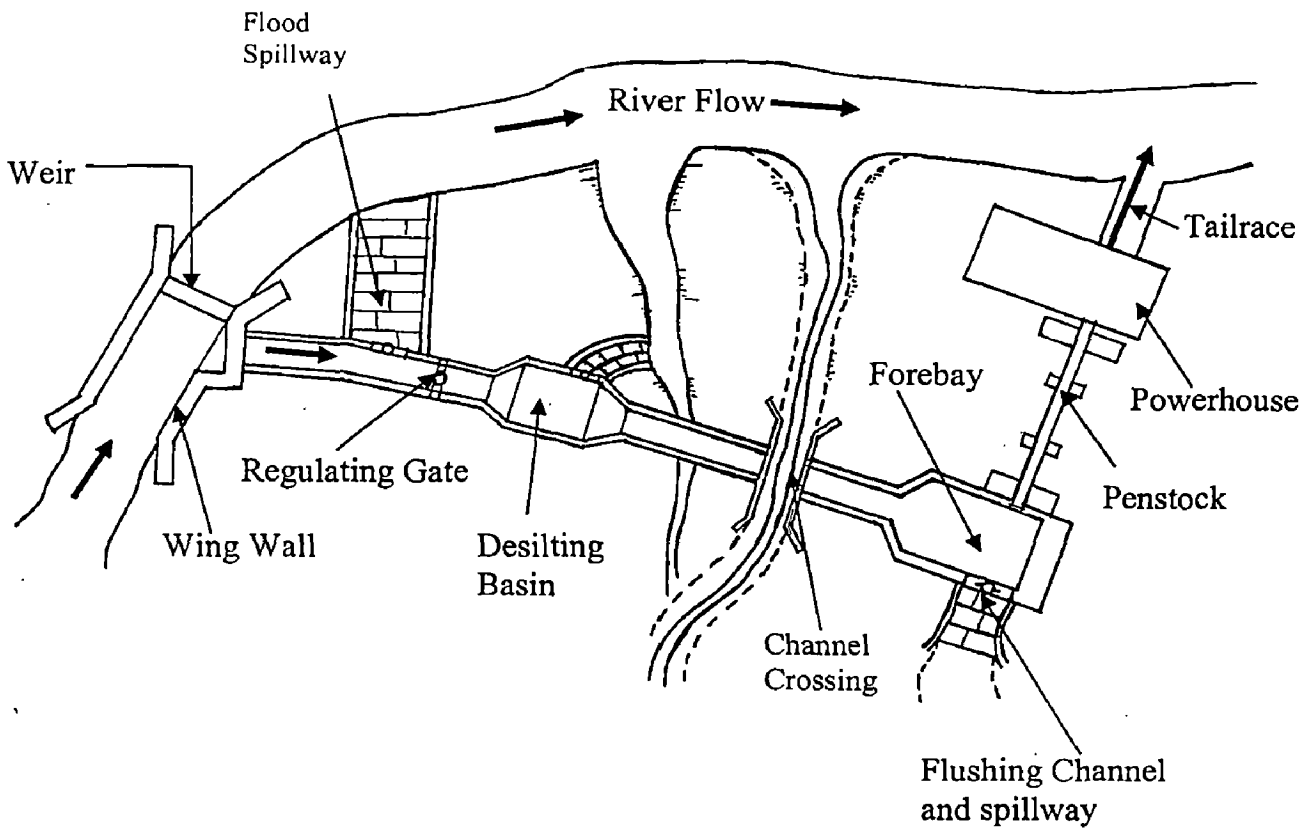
PLAN AND LAYOUT OF SMALL HYDROPOWER SCHEME
